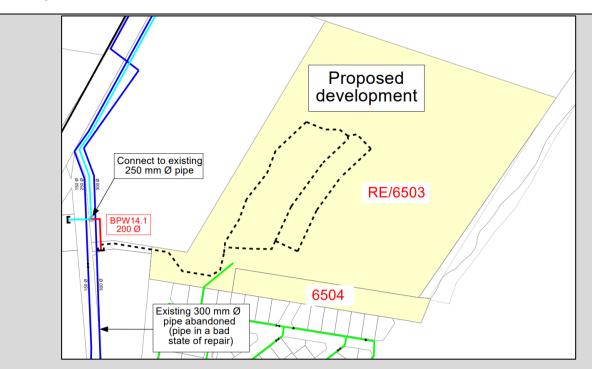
Water pipeline layout for internal water reticulation (extract from GLS Consulting, 2023).
